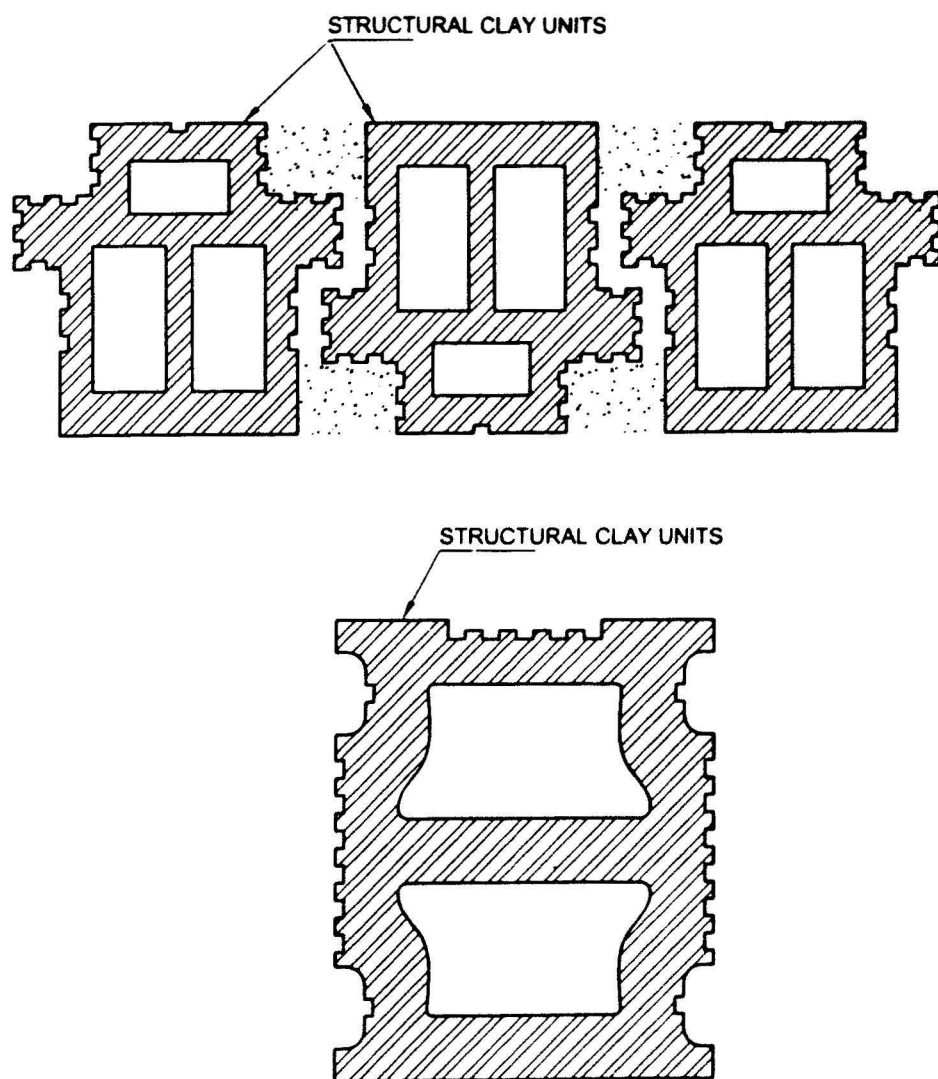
TYPICAL SHAPES OF STRUCTURAL CLAY UNITS FOR FLOORING AND ROOFING
